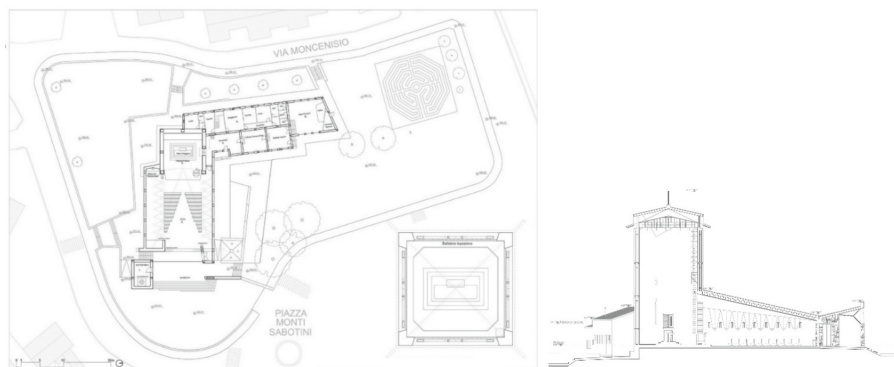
Left: survey ground floor and bell tower; right: longitudinal section (elaborations by the authors).
